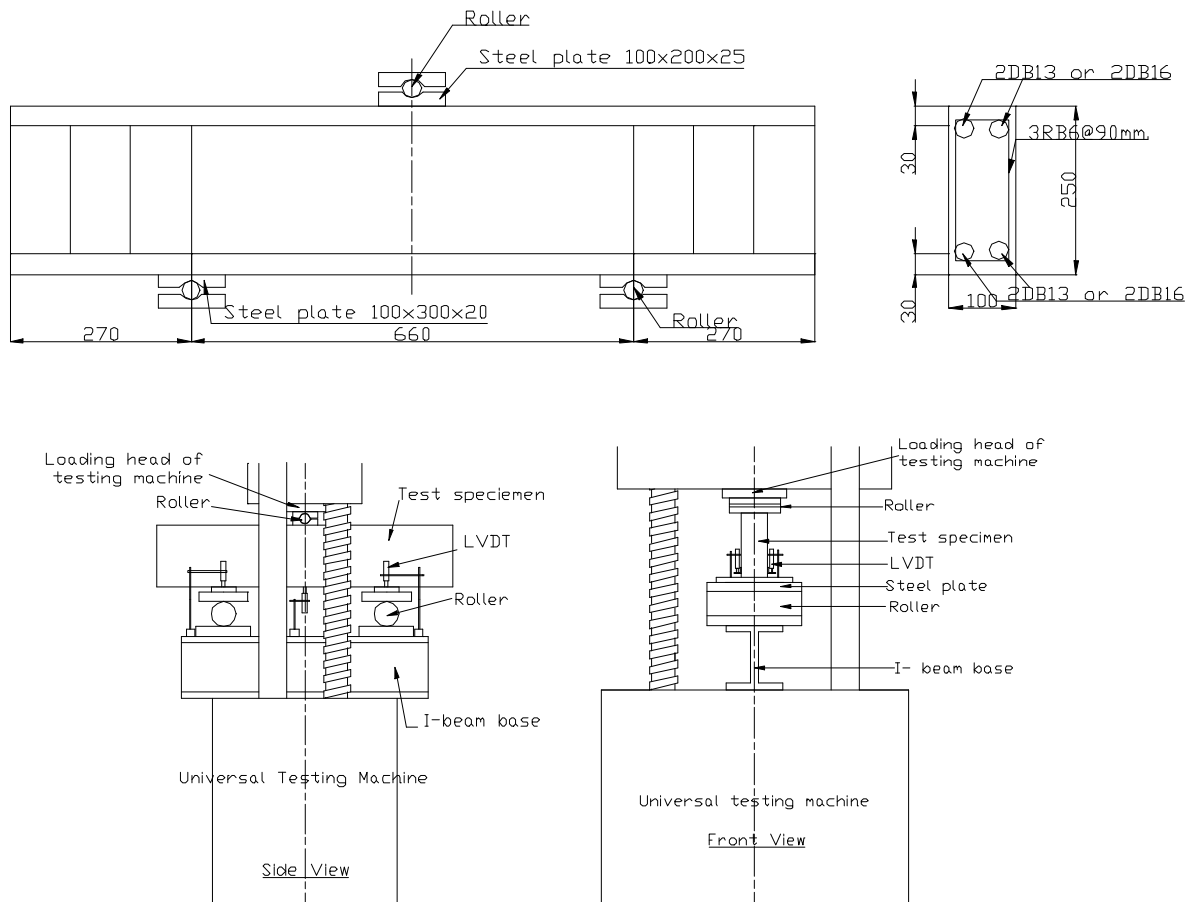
Detail of test beam and testing arrangements (all dimension in mm.)
